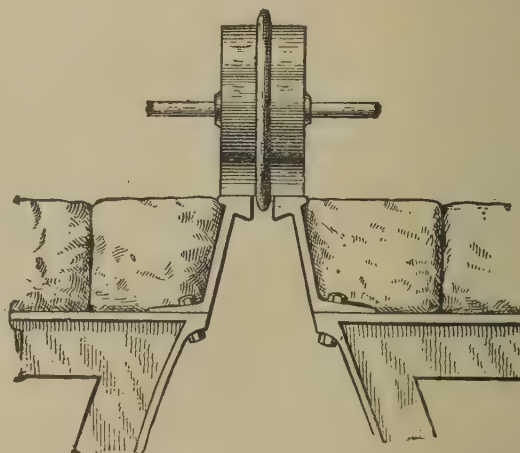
A.—ENLARGED VIEW OF TROLLEY WHEEL.
